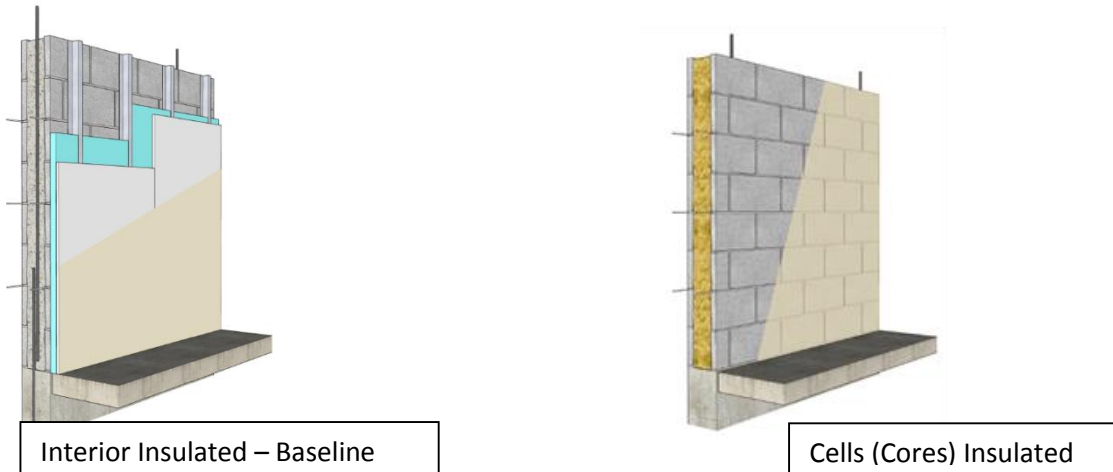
Exterior Masonry Walls, Interior Insulated and Cell Insulated.
